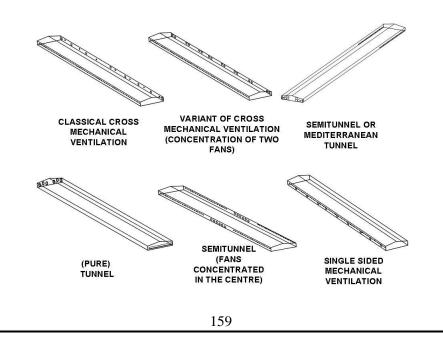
Some broiler building design variants. Mechanical ventilation systems installed.
